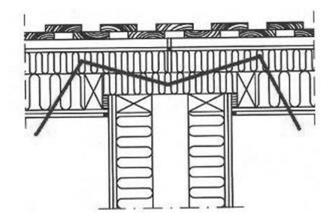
Flanking transmission via the air path of the façade structure.
